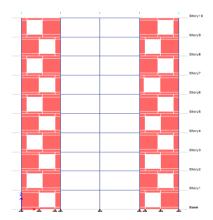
Elevation of the Frame-Shear Wall Building with Staggered Openings
